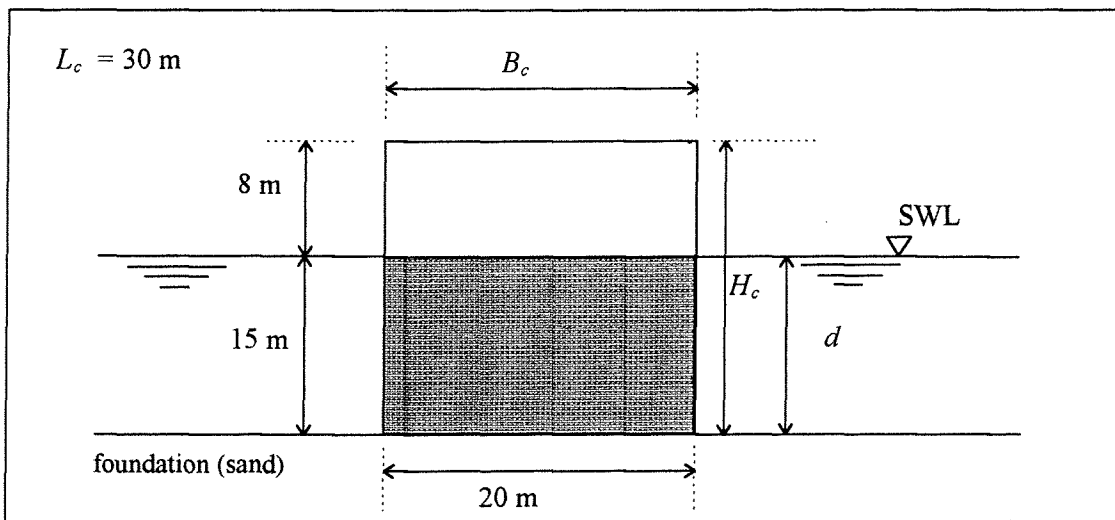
Lay-out of the vertical breakwater of the caisson type
